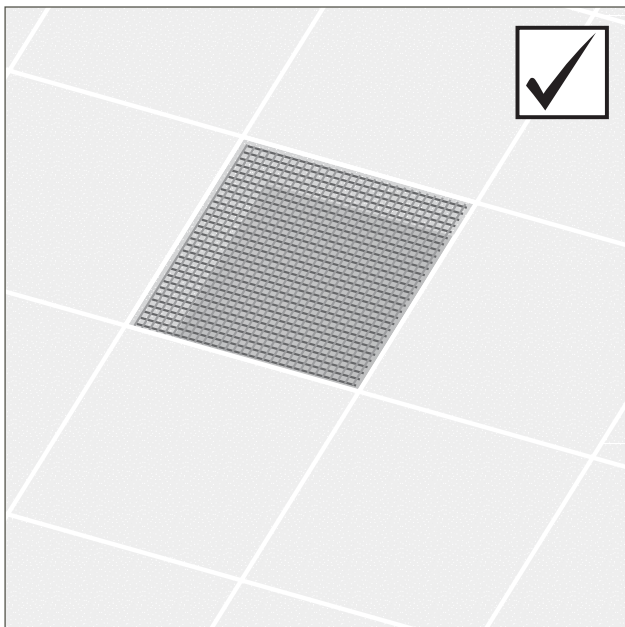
4mm mesh embedded in the concrete floor. The hole also needs to be covered to prevent objects falling through.
